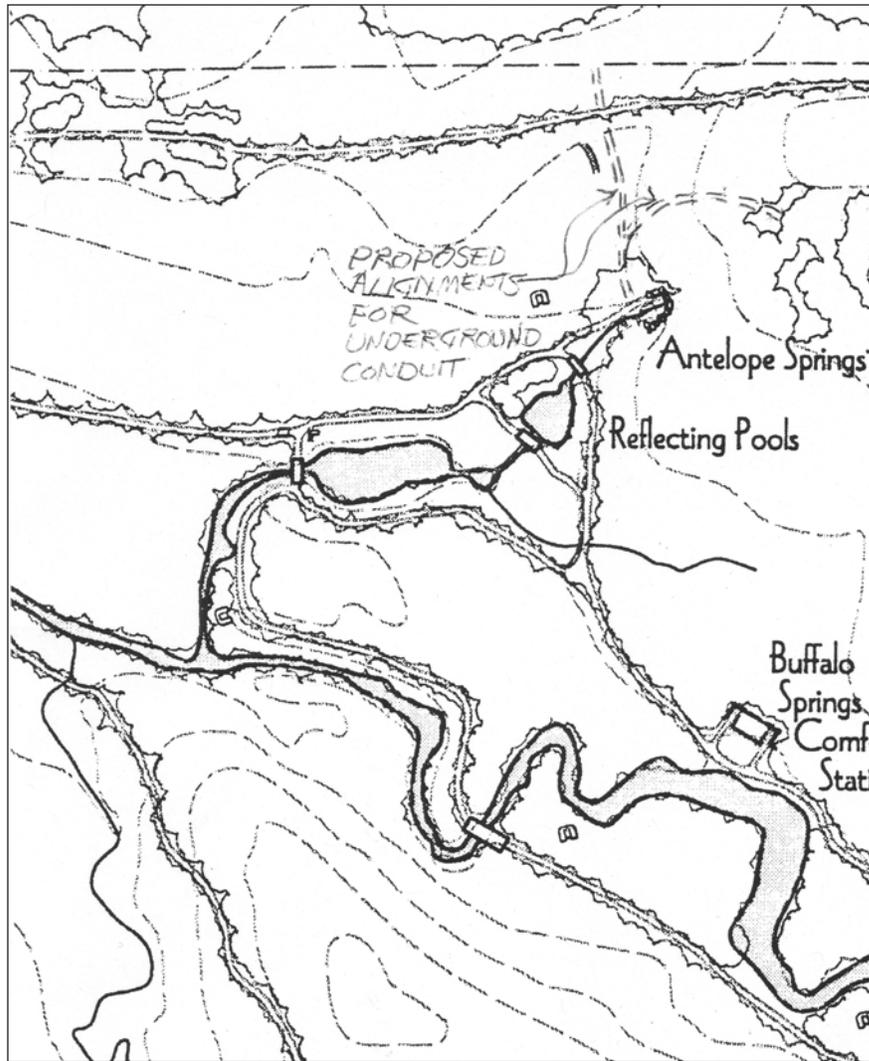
Map showing proposed, alternative routes for underground conduit connected to U.S.G.S. Gauging Station at Antelope Springs.
